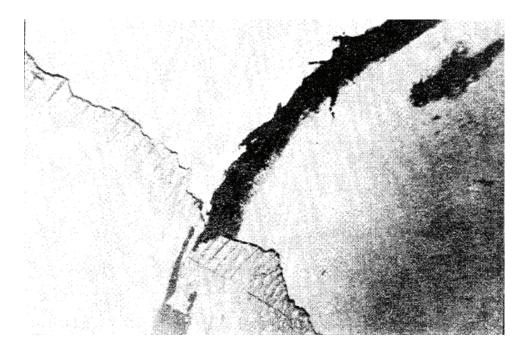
(Exhibit 112) Spalling Exposing Reinforcing Steel
